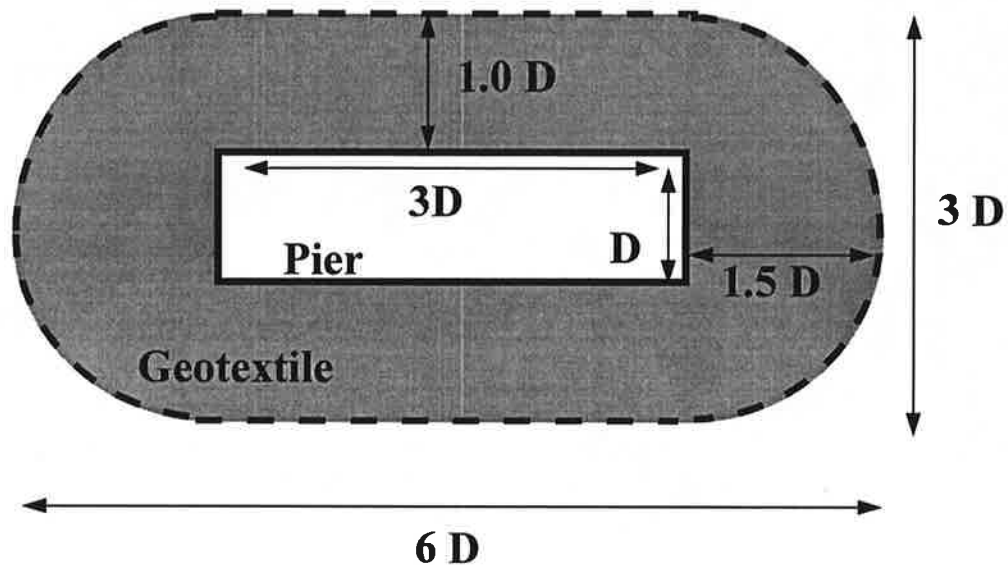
Sketch of placement of geotextile around a rectangular pier.
